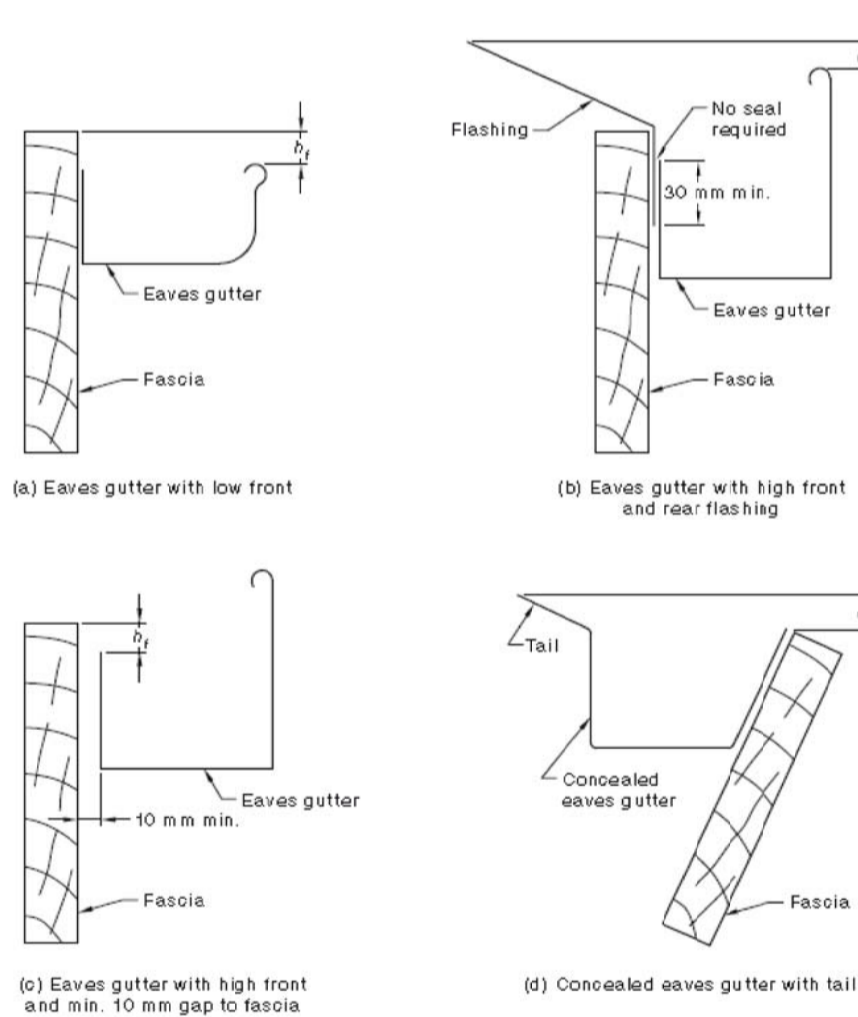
EAVES GUTTER OVERFLOW METHODS
